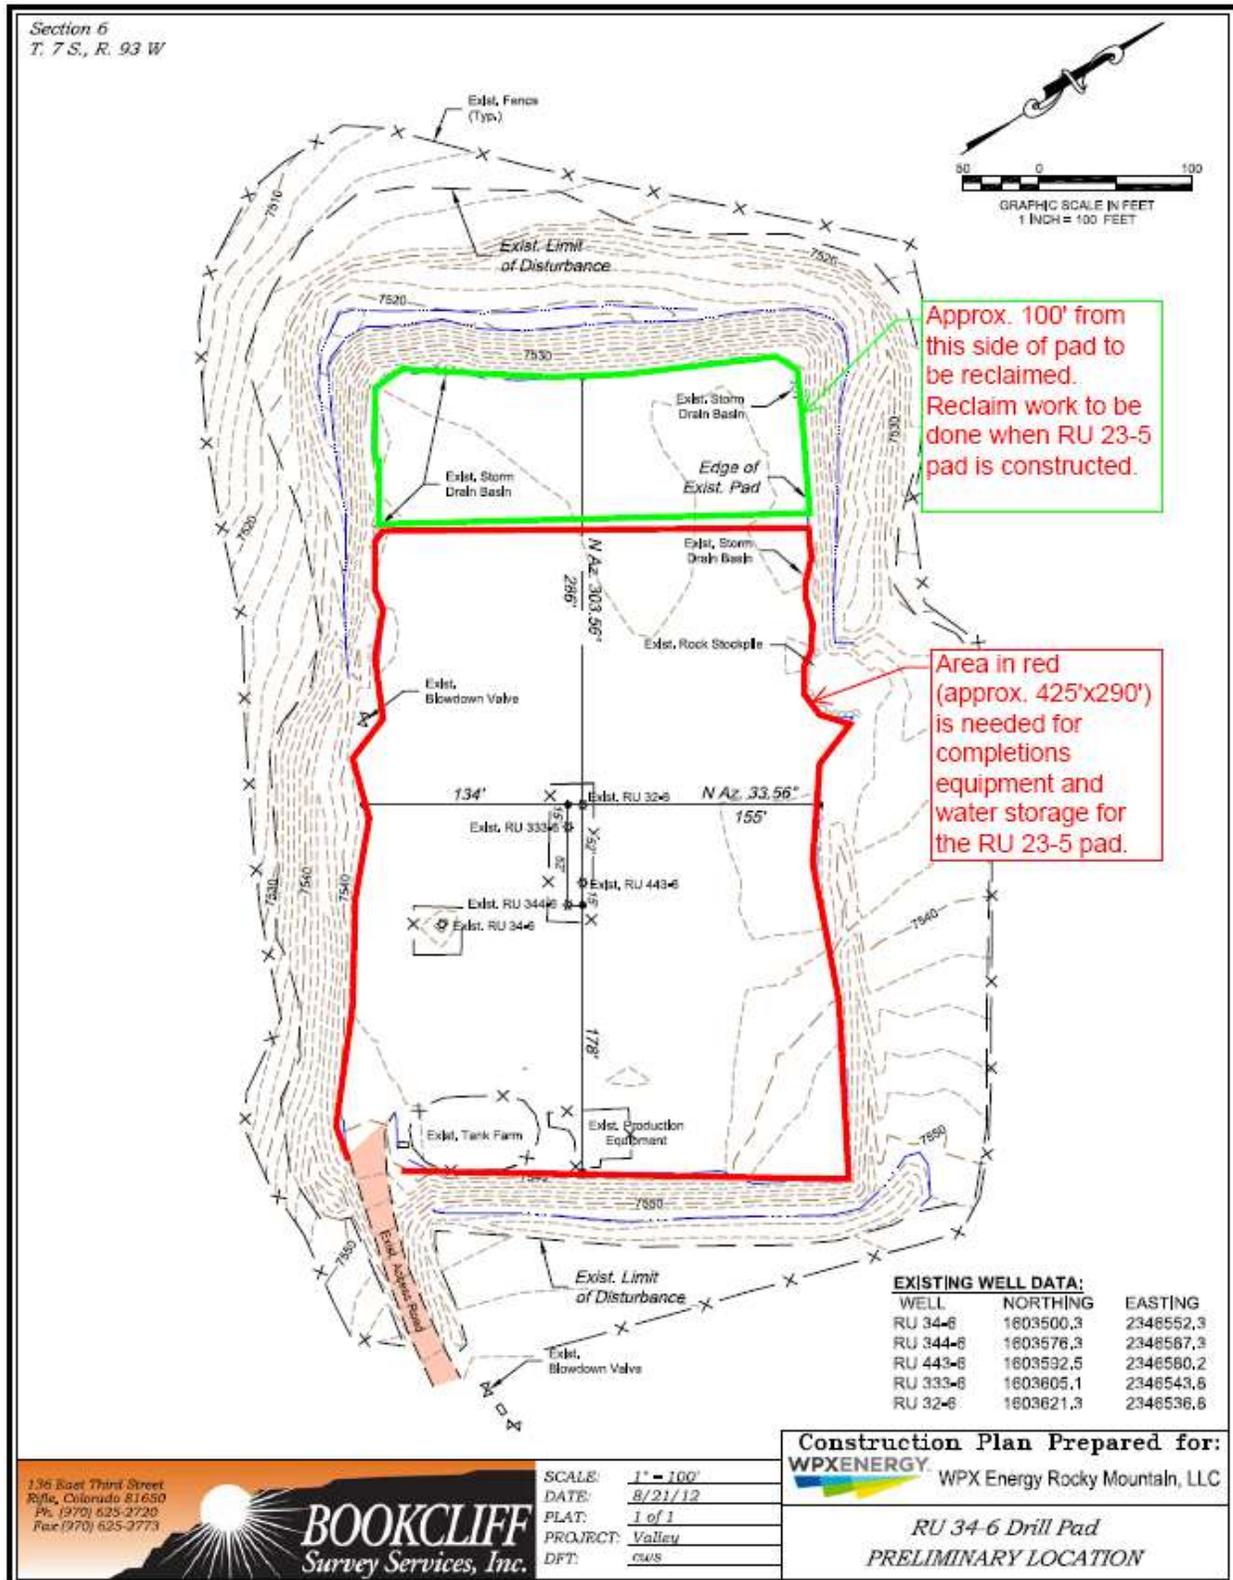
RU 34-6 Pad Layout Showing Remote Frac Area to Support RU 23-5 Well Completions.
